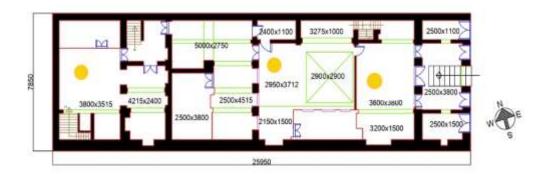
First Floor Plan of Vernacular Haveli VH1 Source: Author
